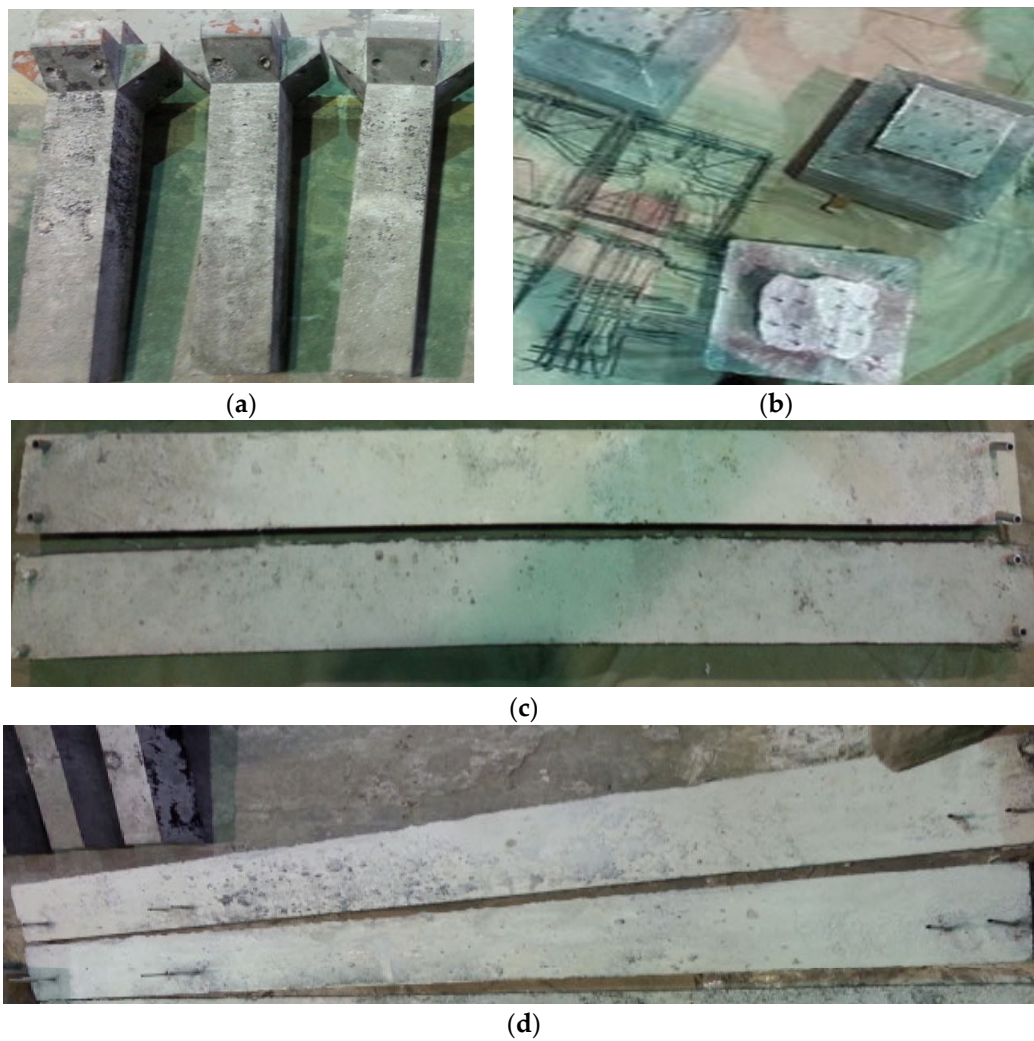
IBS components after casting: (a) columns; (b) hollow core footings; (c) beams; (d) slabs.
